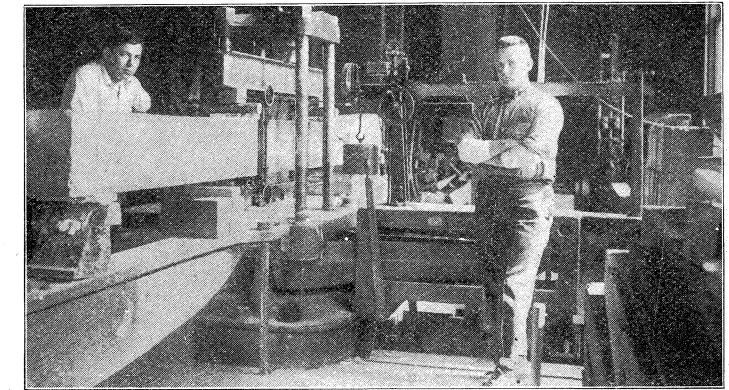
TESTING A REINFORCED CONCRETE BEAM
